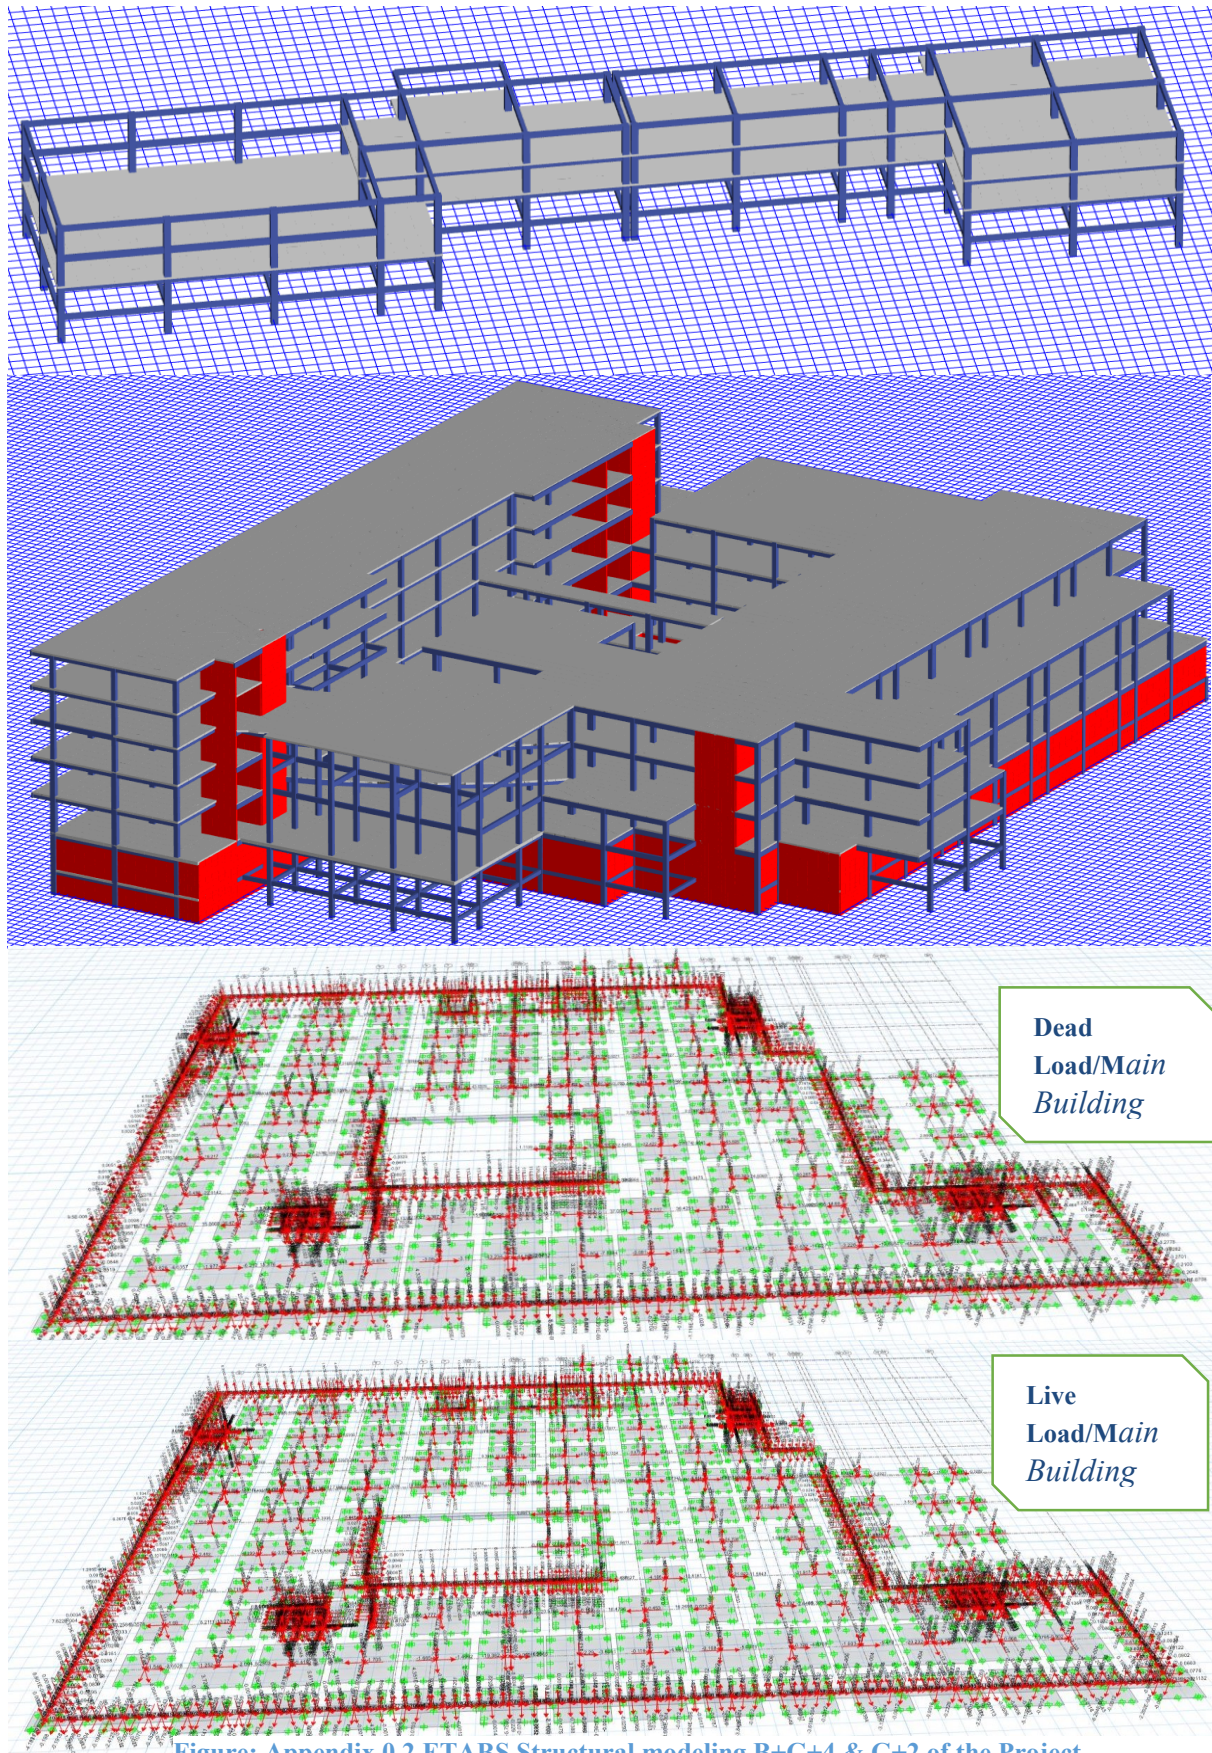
Figure: Appendix.0.2 ETABS Structural modeling B+G+4 & G+2 of the Project
